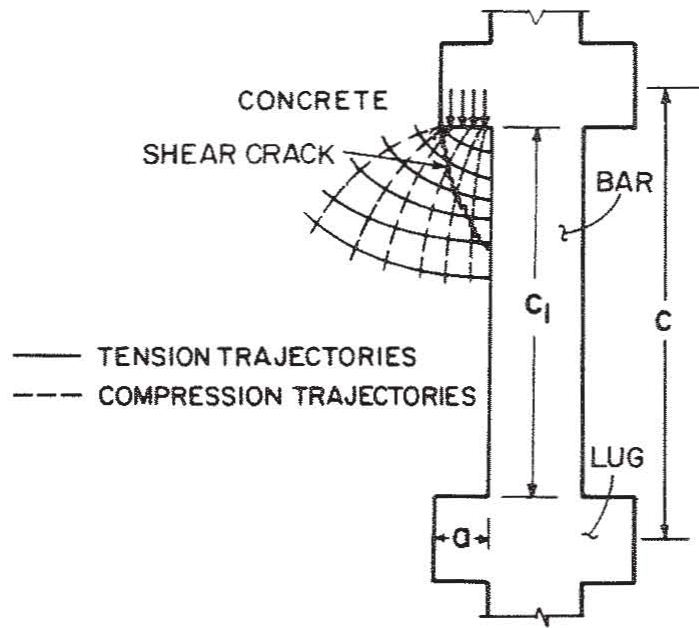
SHEAR CRACKS IN THE CONCRETE KEYS BETWEEN LUGS (AFTER [10]).
